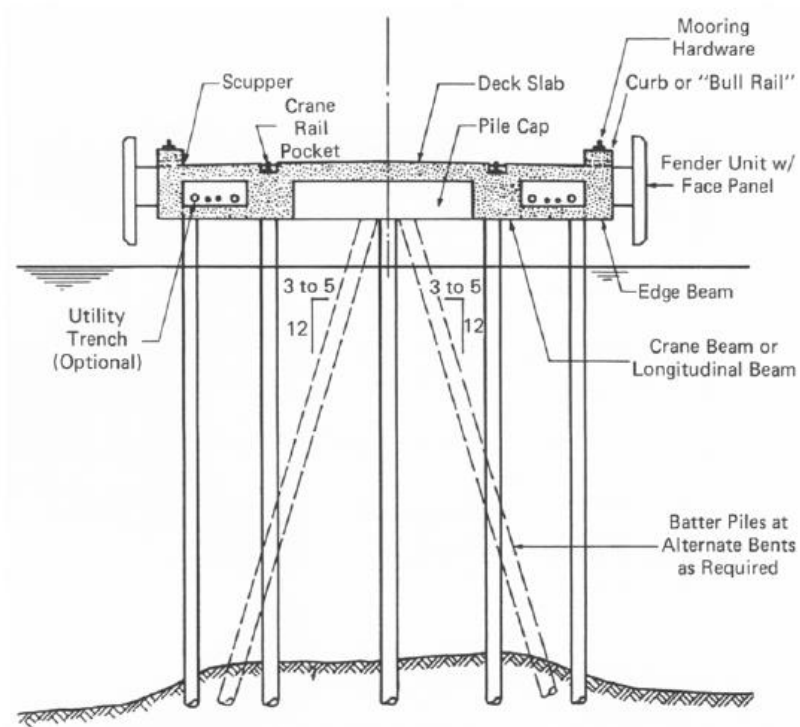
Typical concrete pier nomenclature. (Gaythwaite, 2004: 241)
